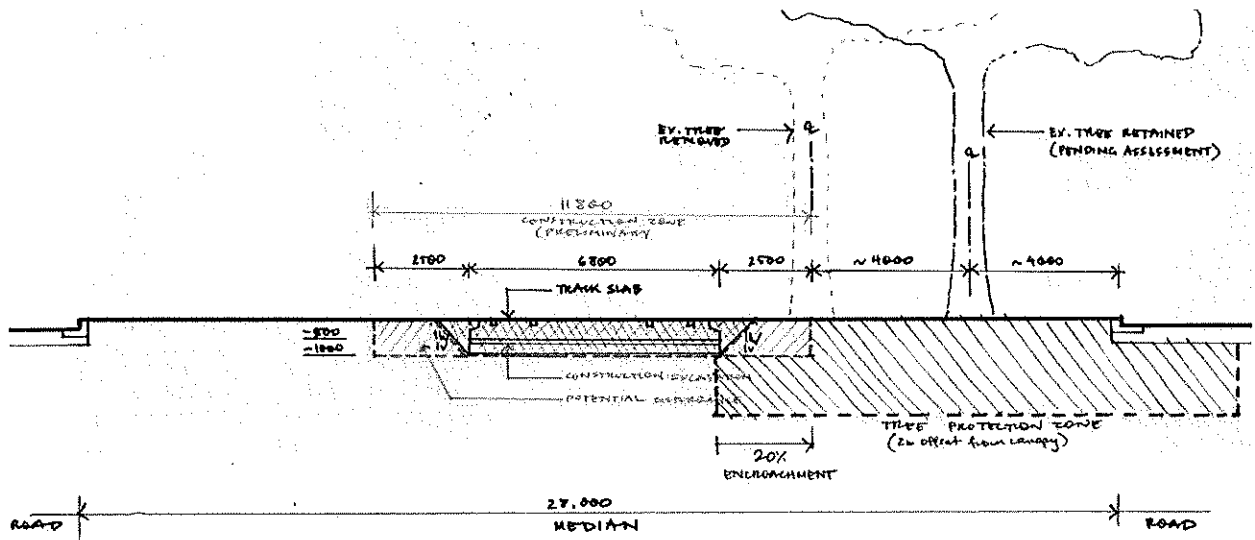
Typical cross section through Northbourne Avenue showing trackform, TPZ & construction zone
